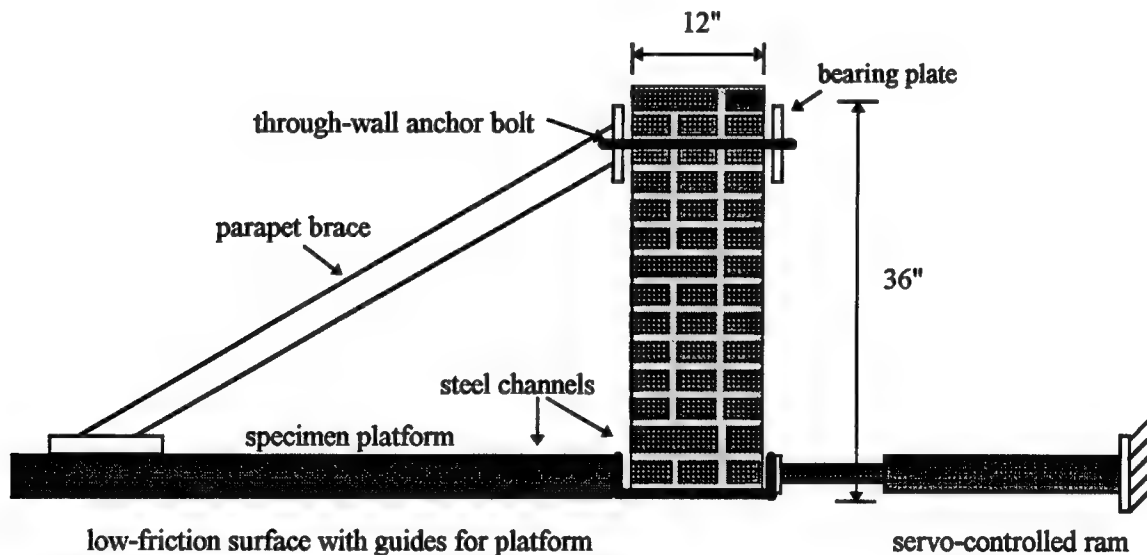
Laboratory Specimen: 3-Wythe Header-Bonded Wall with Veneer
